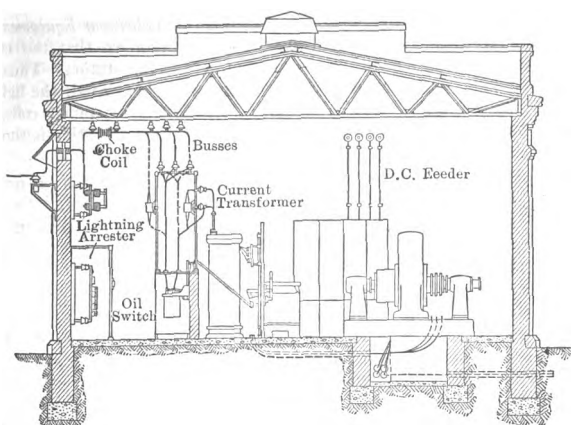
Plan and Elevation of Typical Railway A-C.-D-C. Substation
